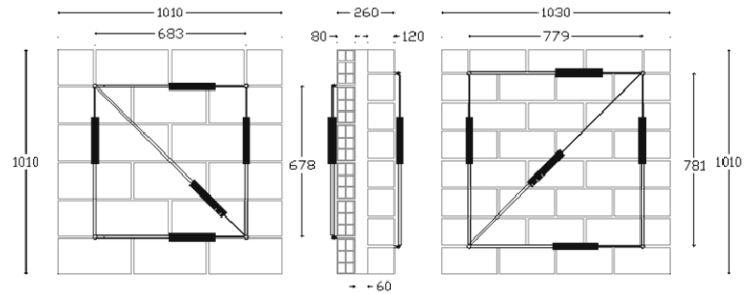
double panel walls layout of sensors on the wall compressed parallel to holes [mm]
